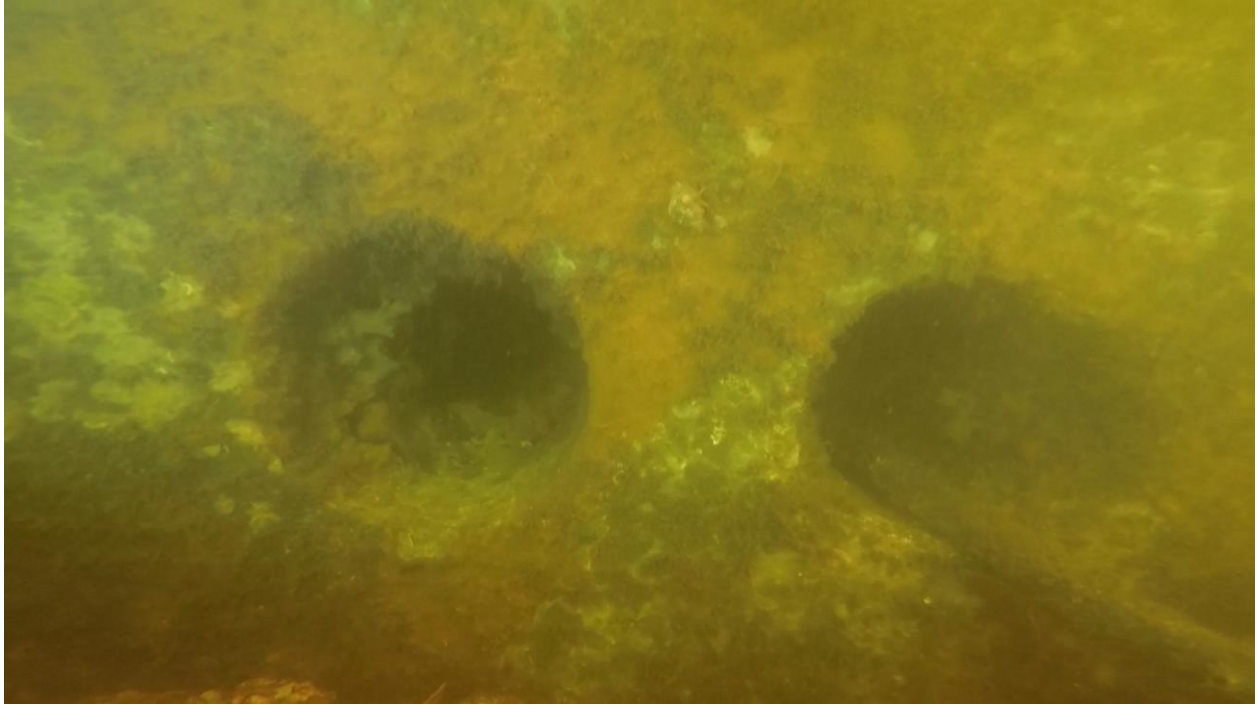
Sta 0+84. Western end of outfall structure looking east. Note the cable entering the eastern opening.
